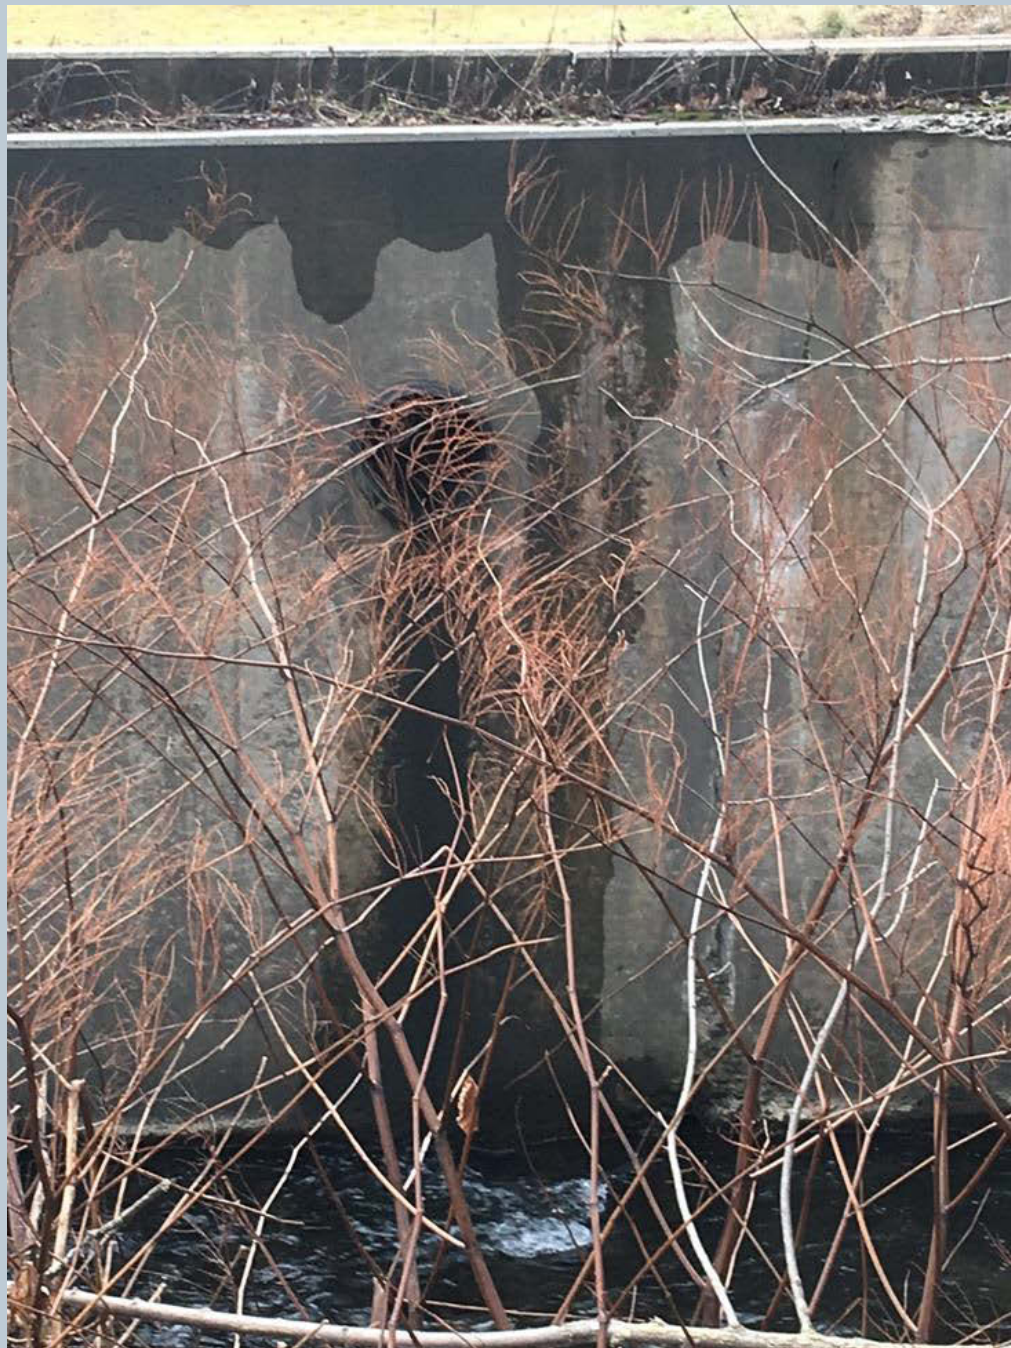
An 18-inch dry black HDPE stormwater pipe comes through the upper retaining wall, which is draining from State Route 309.
